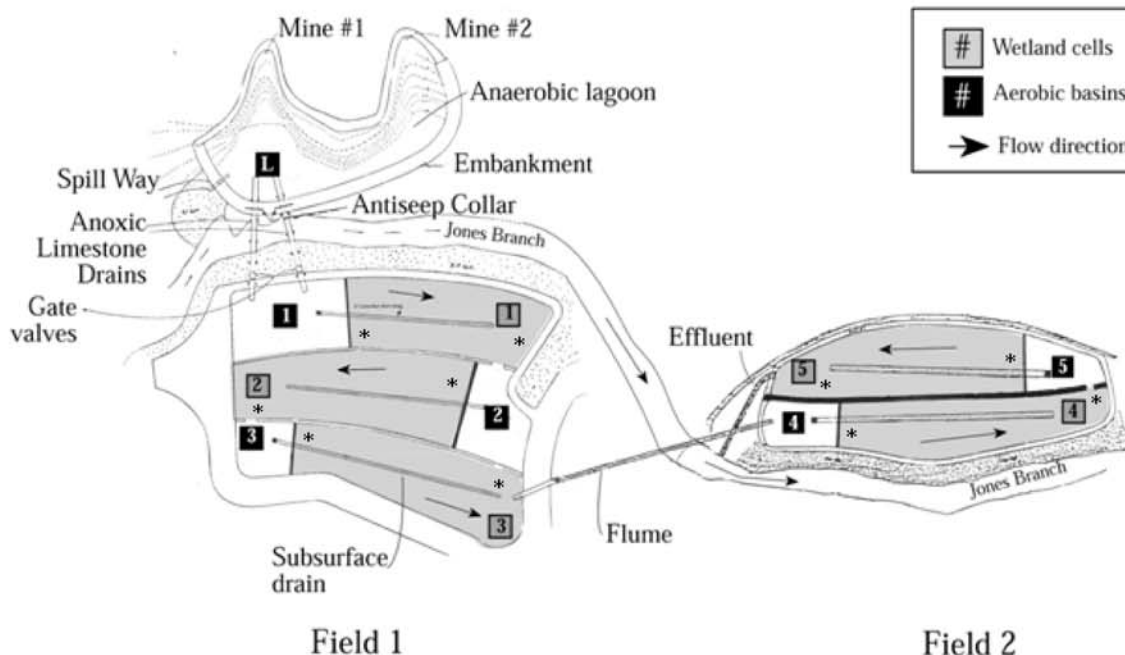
Site plan and sampling points(*) for the Jones Branch constructed wetland
